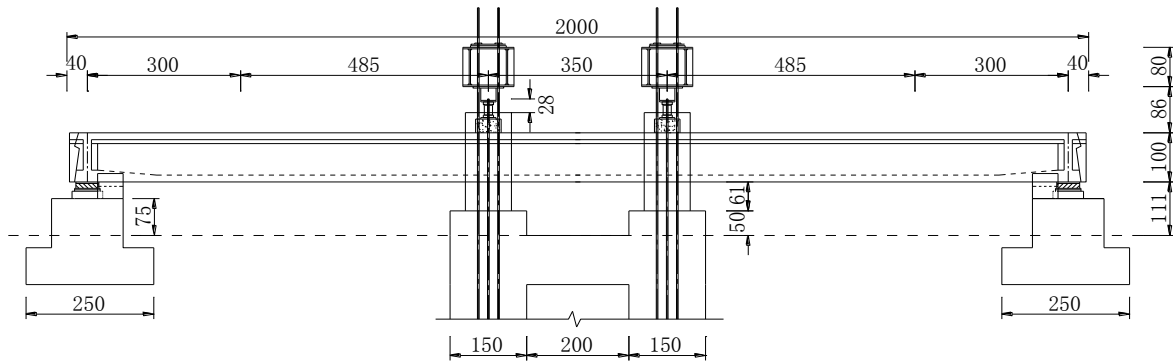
Test girder strengthening by concrete composite layer, gluing steel plate and prestressed CFRP
